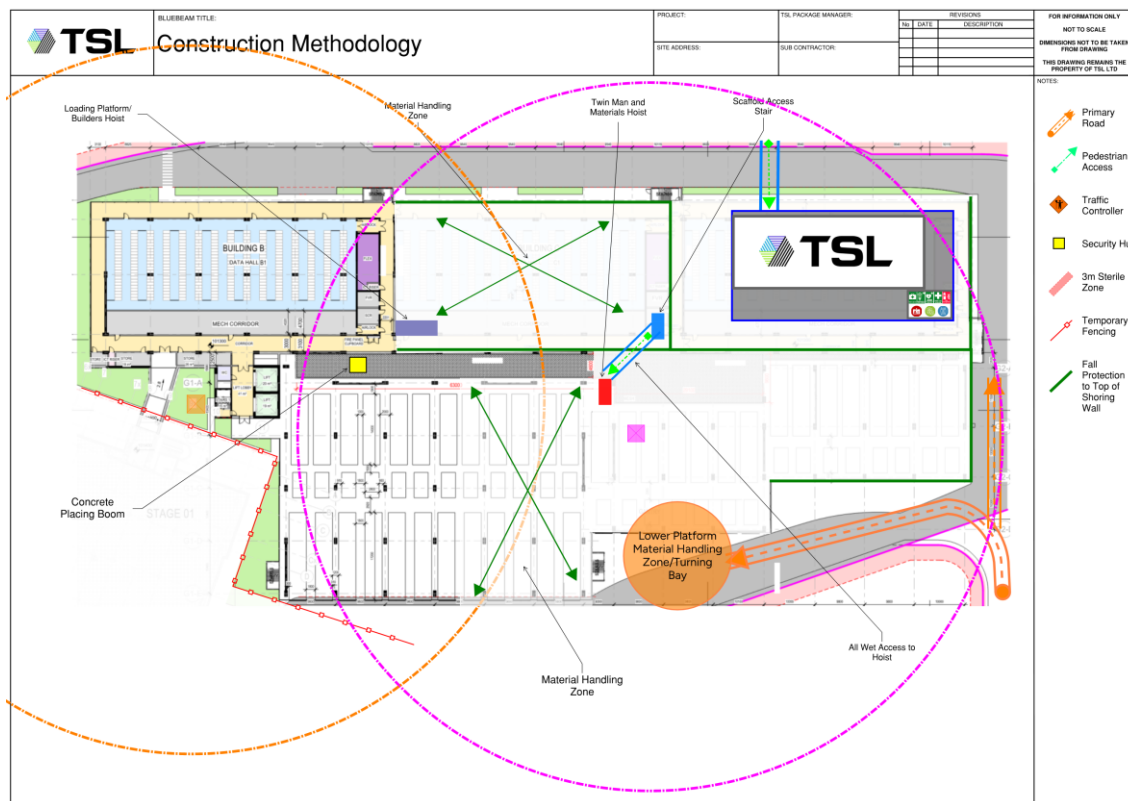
Construction methodology Building B Level 3 (Data Hall Level)
